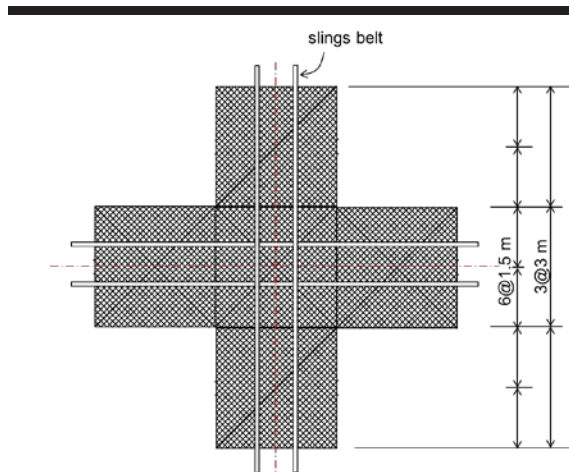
Plan layout of one of the target stone bags (3 m x 3 m x 3m).
